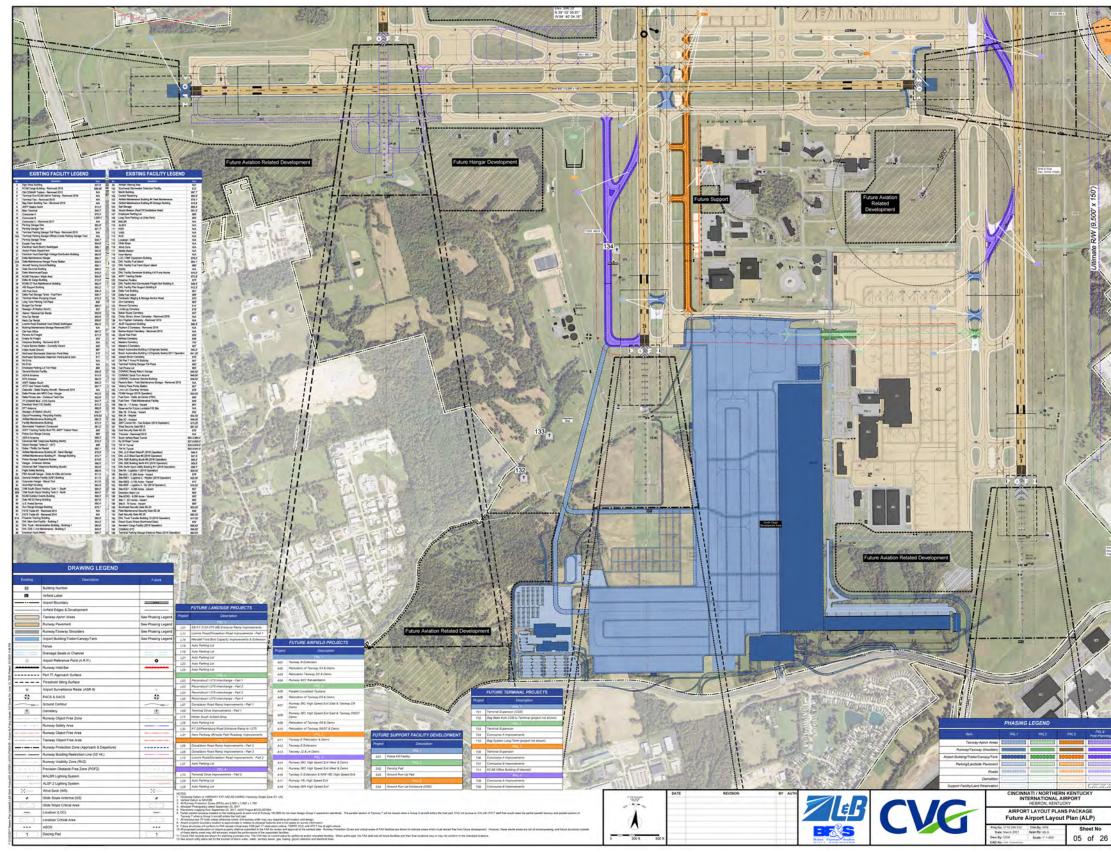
SHEET 04: FUTURE AIRPORT LAYOUT PLAN - NORTH
